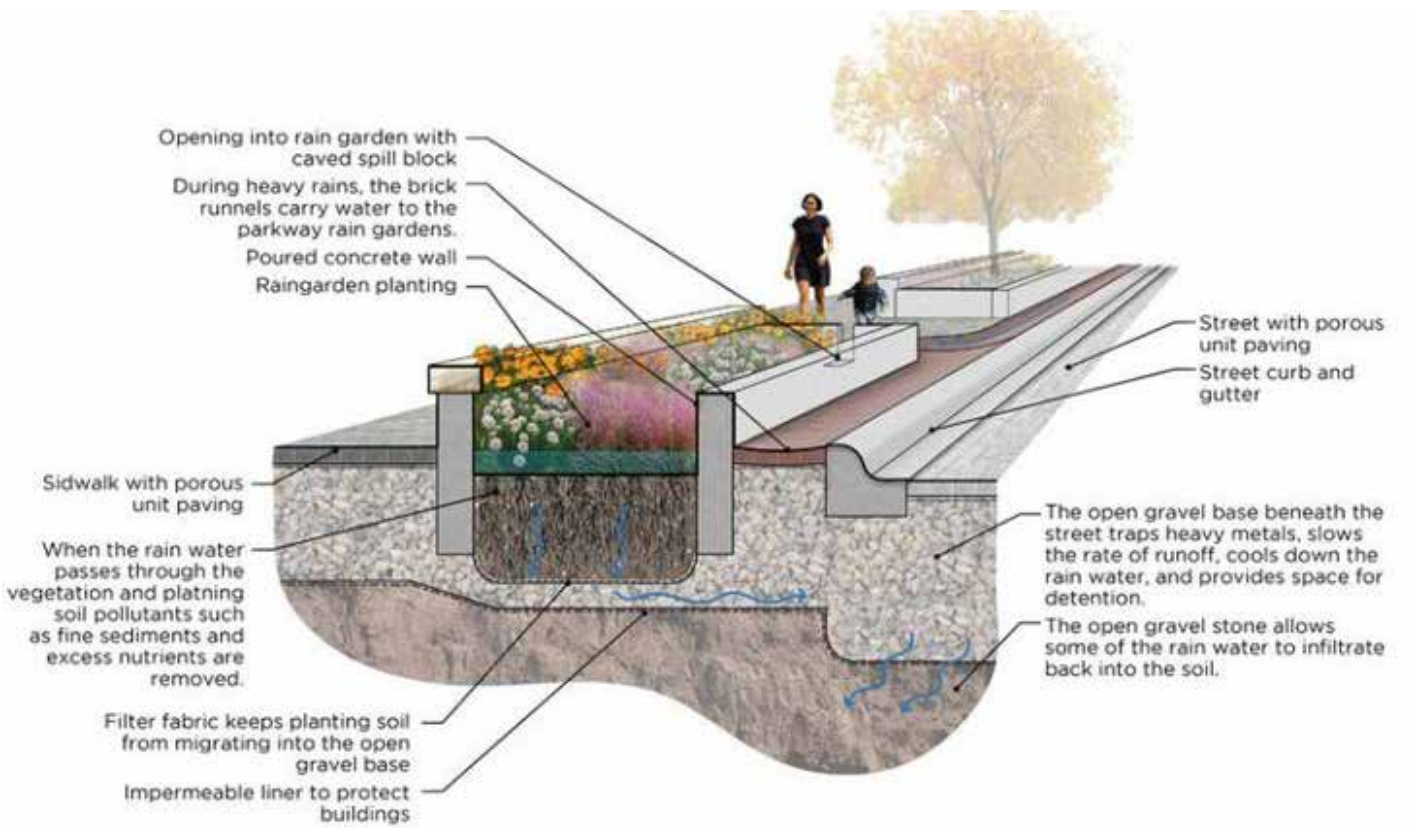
Raingarden Section, Credit: City of West Union
